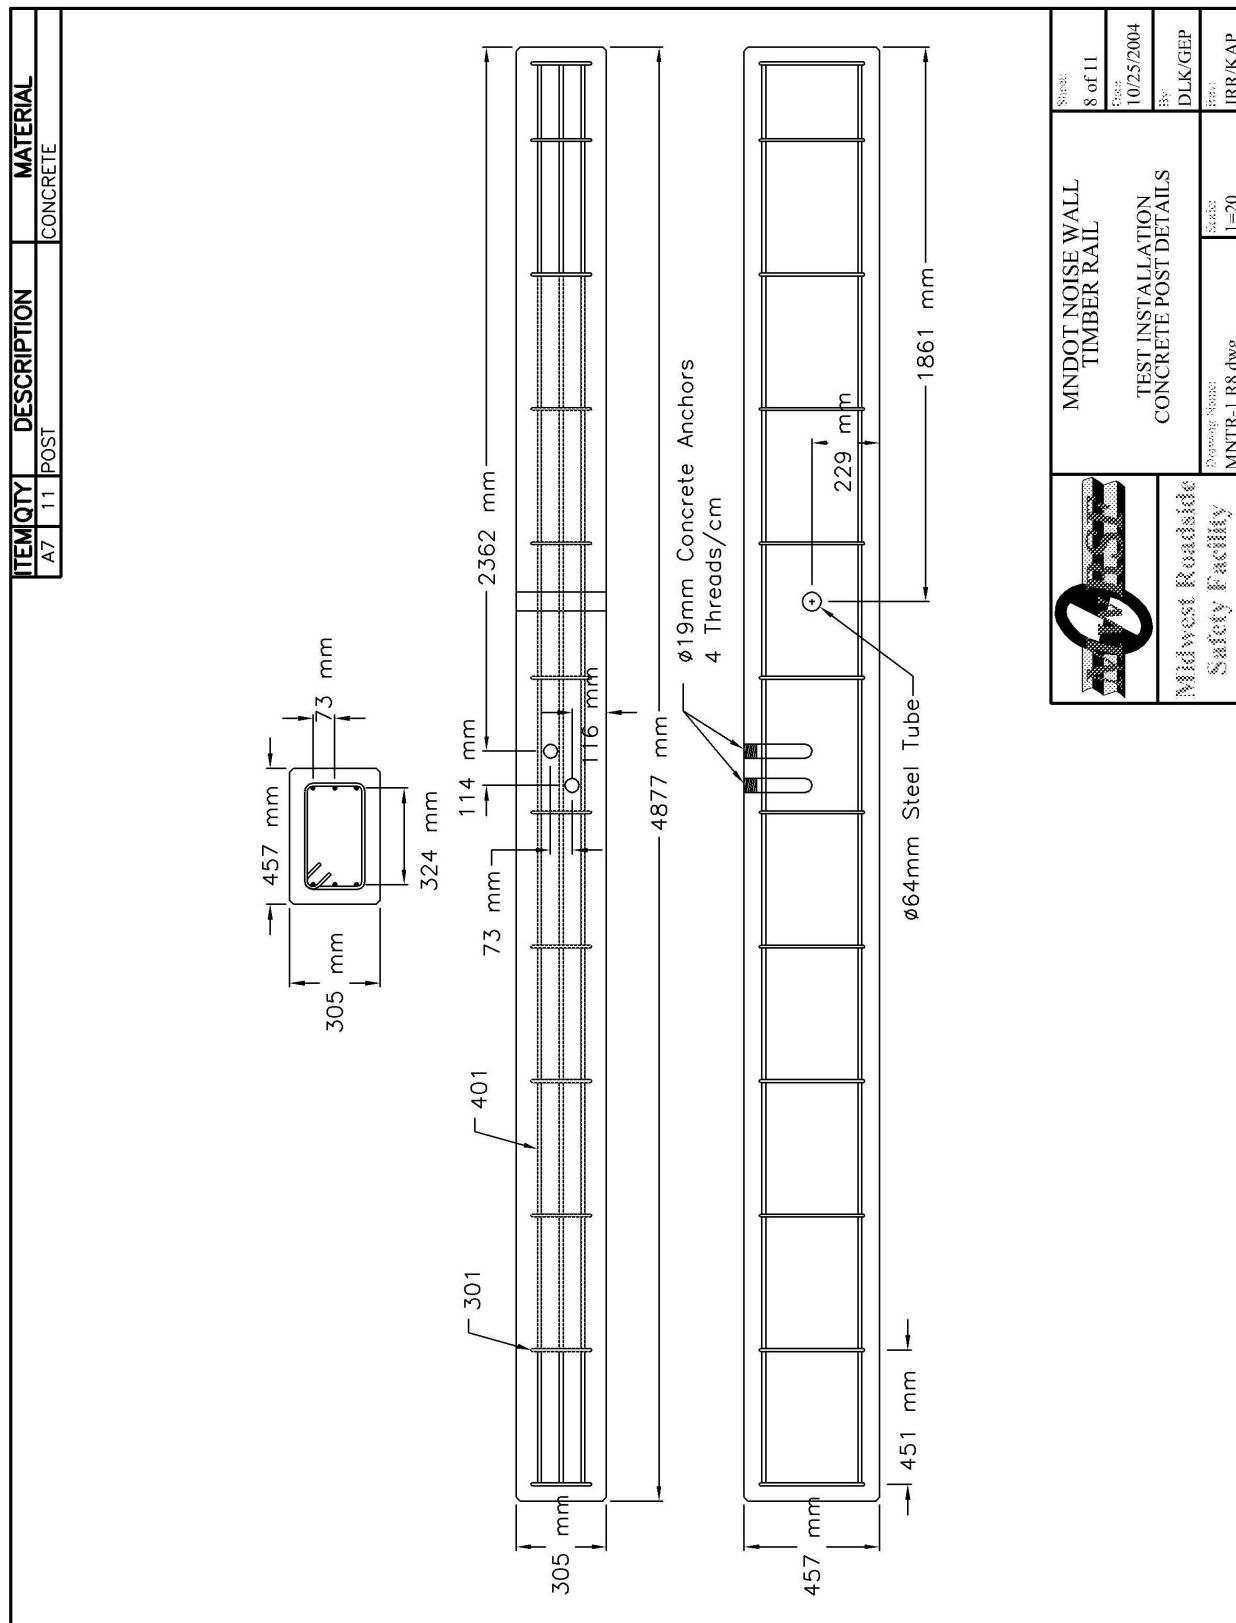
Mn/DOT's Timber Rub Rail Design Concrete Post Details
